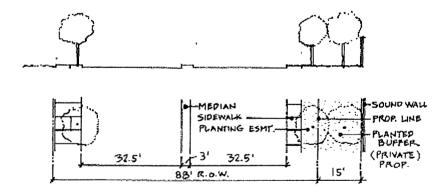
Street Section. Countryside Drive between Tuolumne Road and Fulkerth Road.
